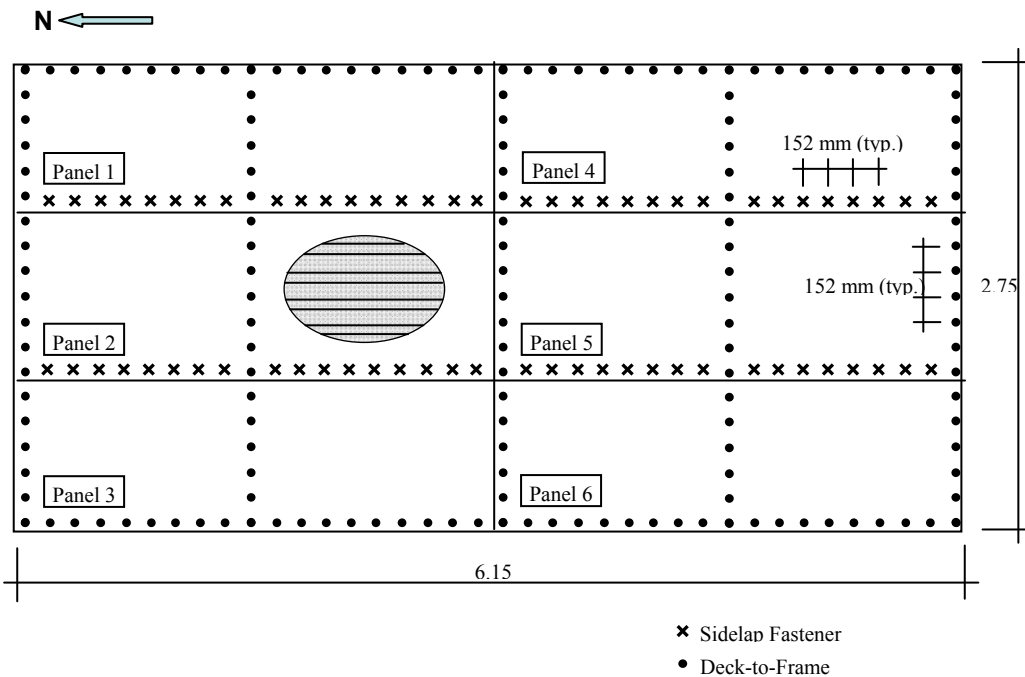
Schematic plan view of test specimens and layout of deck-to-frame and sidelap connections.
